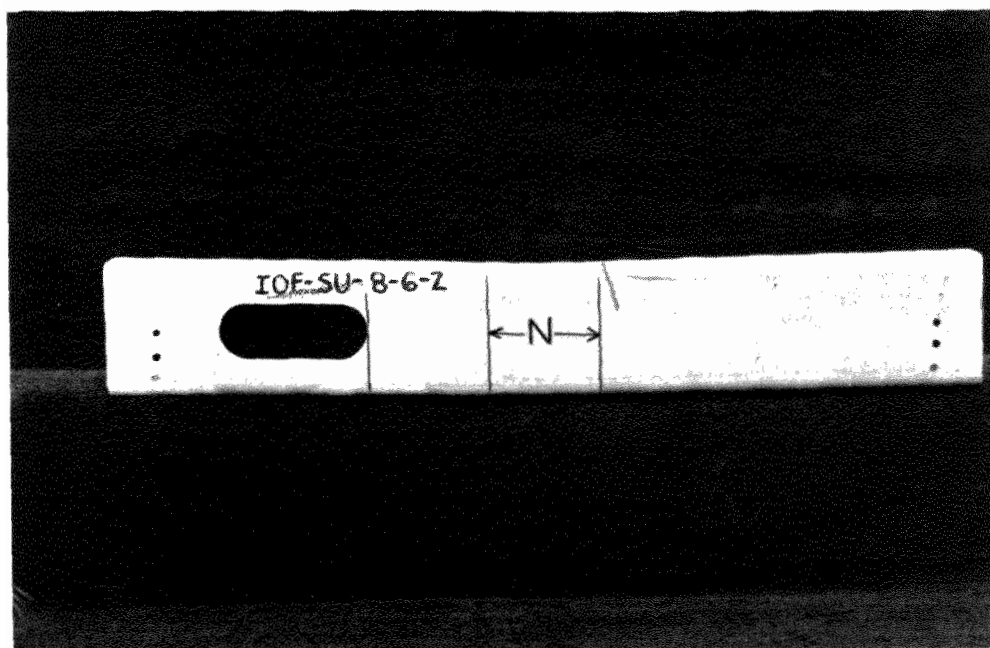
Typical Unreinforced IOF Web Crippling Failure, IOF-SU-8-6-2
